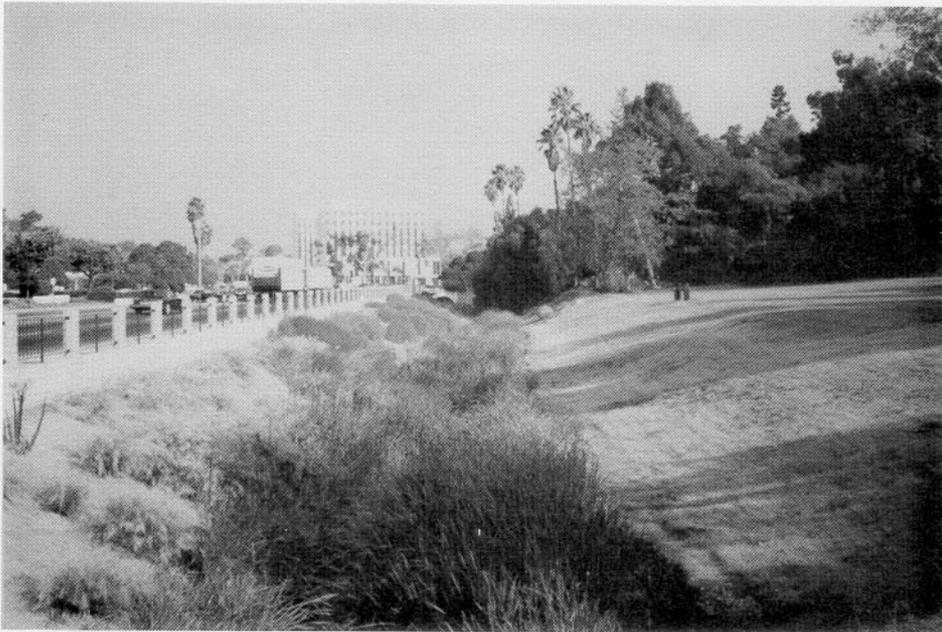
Unlined earth channel at Hillcrest Park (view toward upstream from Valley View Drive).
